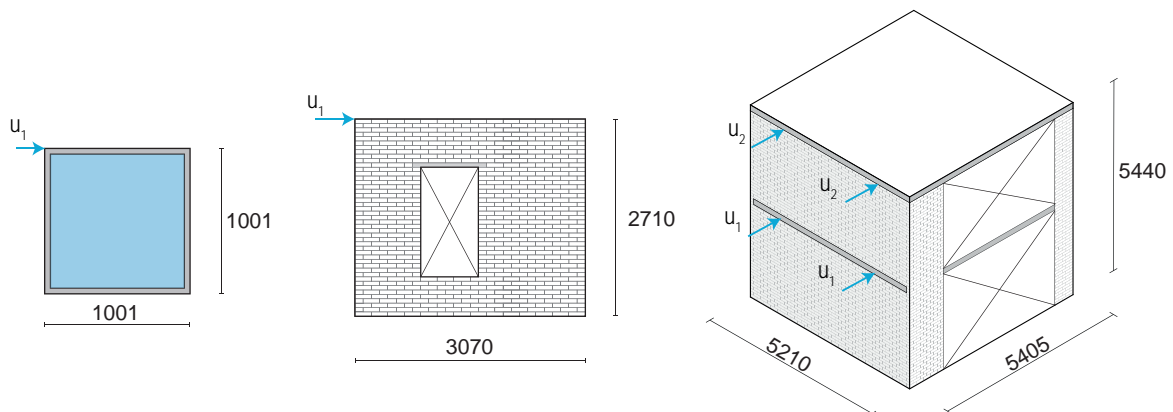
Overview of validation studies from small to large: window, URM wall, two-storey building.
